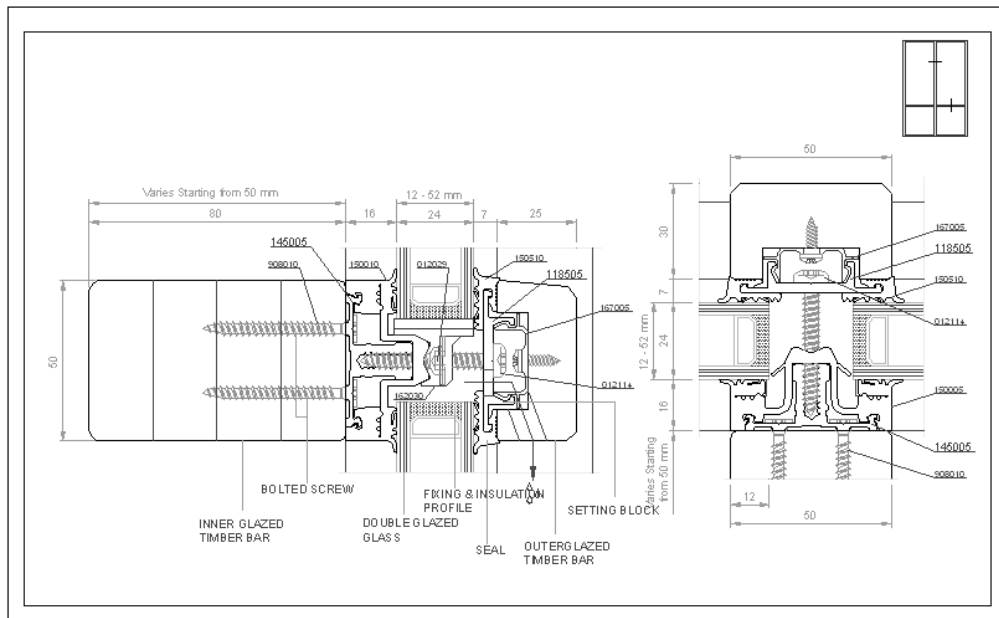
The Glazed Timber Profile Detail for Curtain Wall System for Mullion (Drawn by Author)
